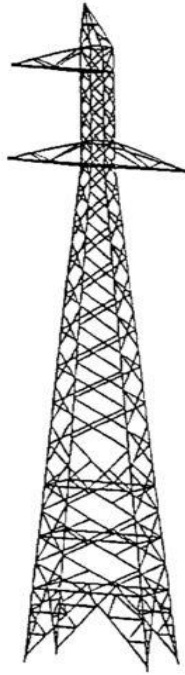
An existing 220-kV as built tower (Albermani and Kitipornchai, 2003).
